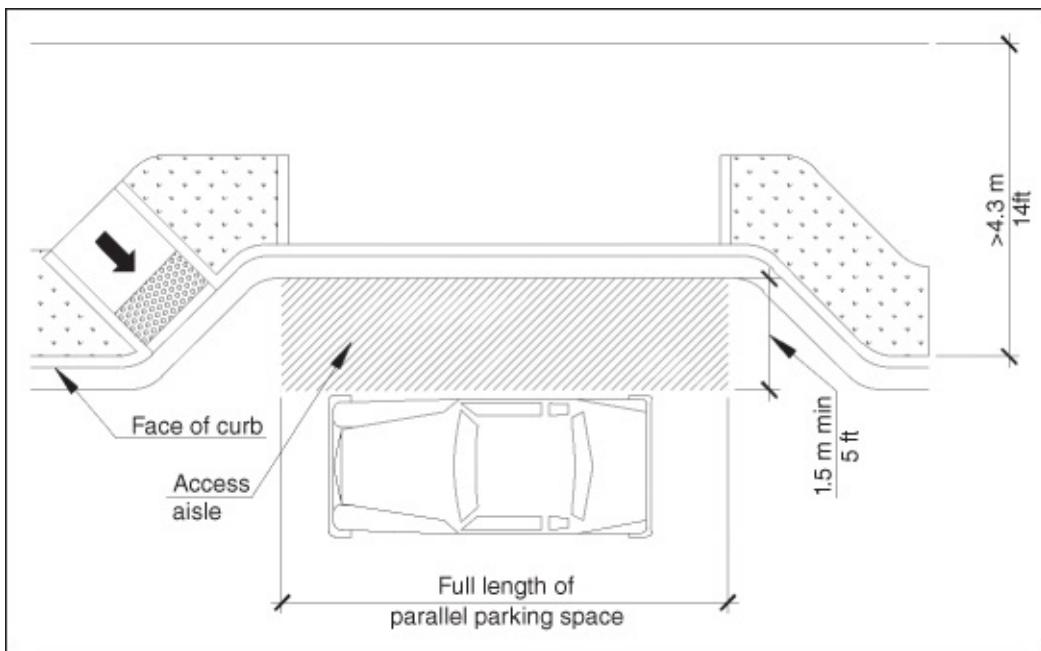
Accessible Parallel Parking Stall in Wide Sidewalks
